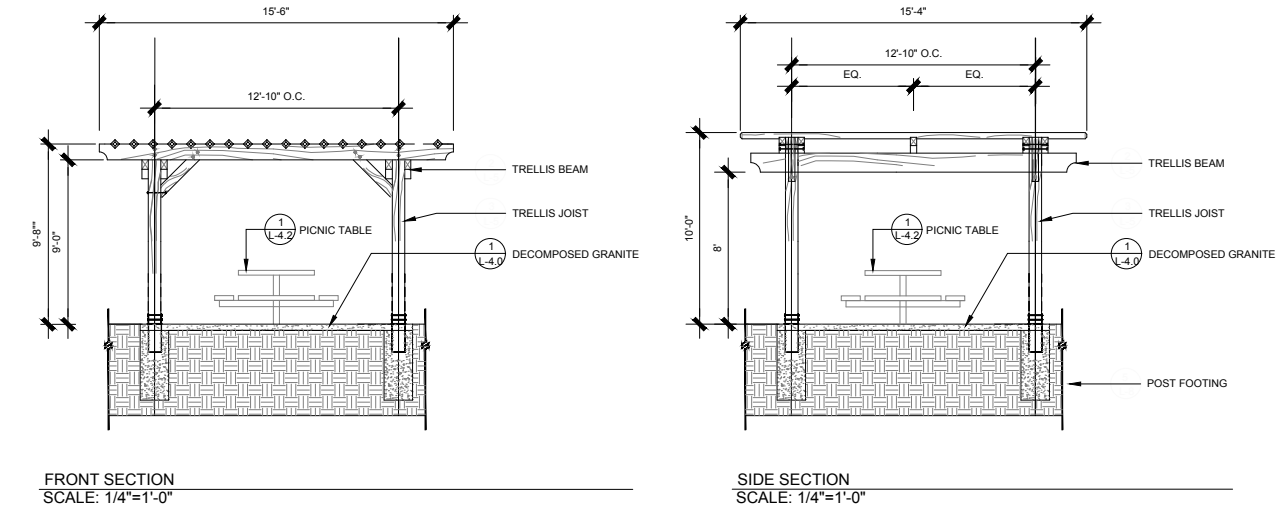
TRELLIS, PICNIC TABLE, RAISED PLANTER, ARBOR DETAIL
